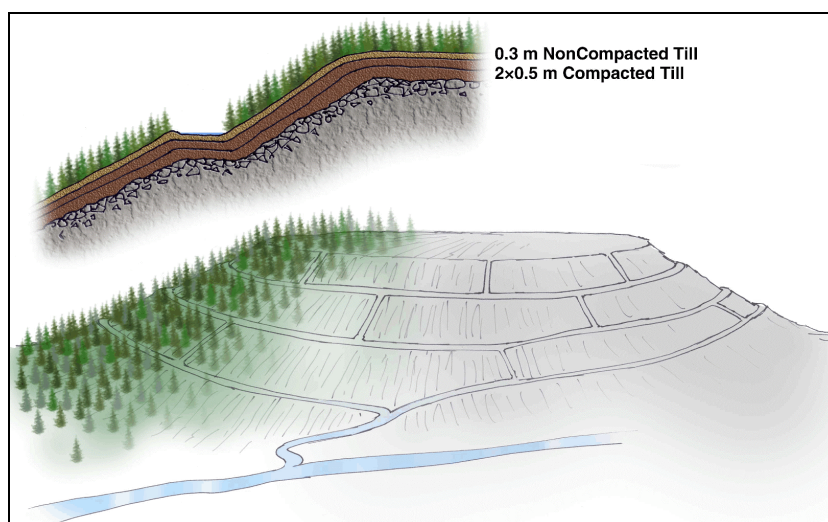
Structure of waste-rock dump cover and illustration of the decommissioned waste-rock dump at the Aitik site
